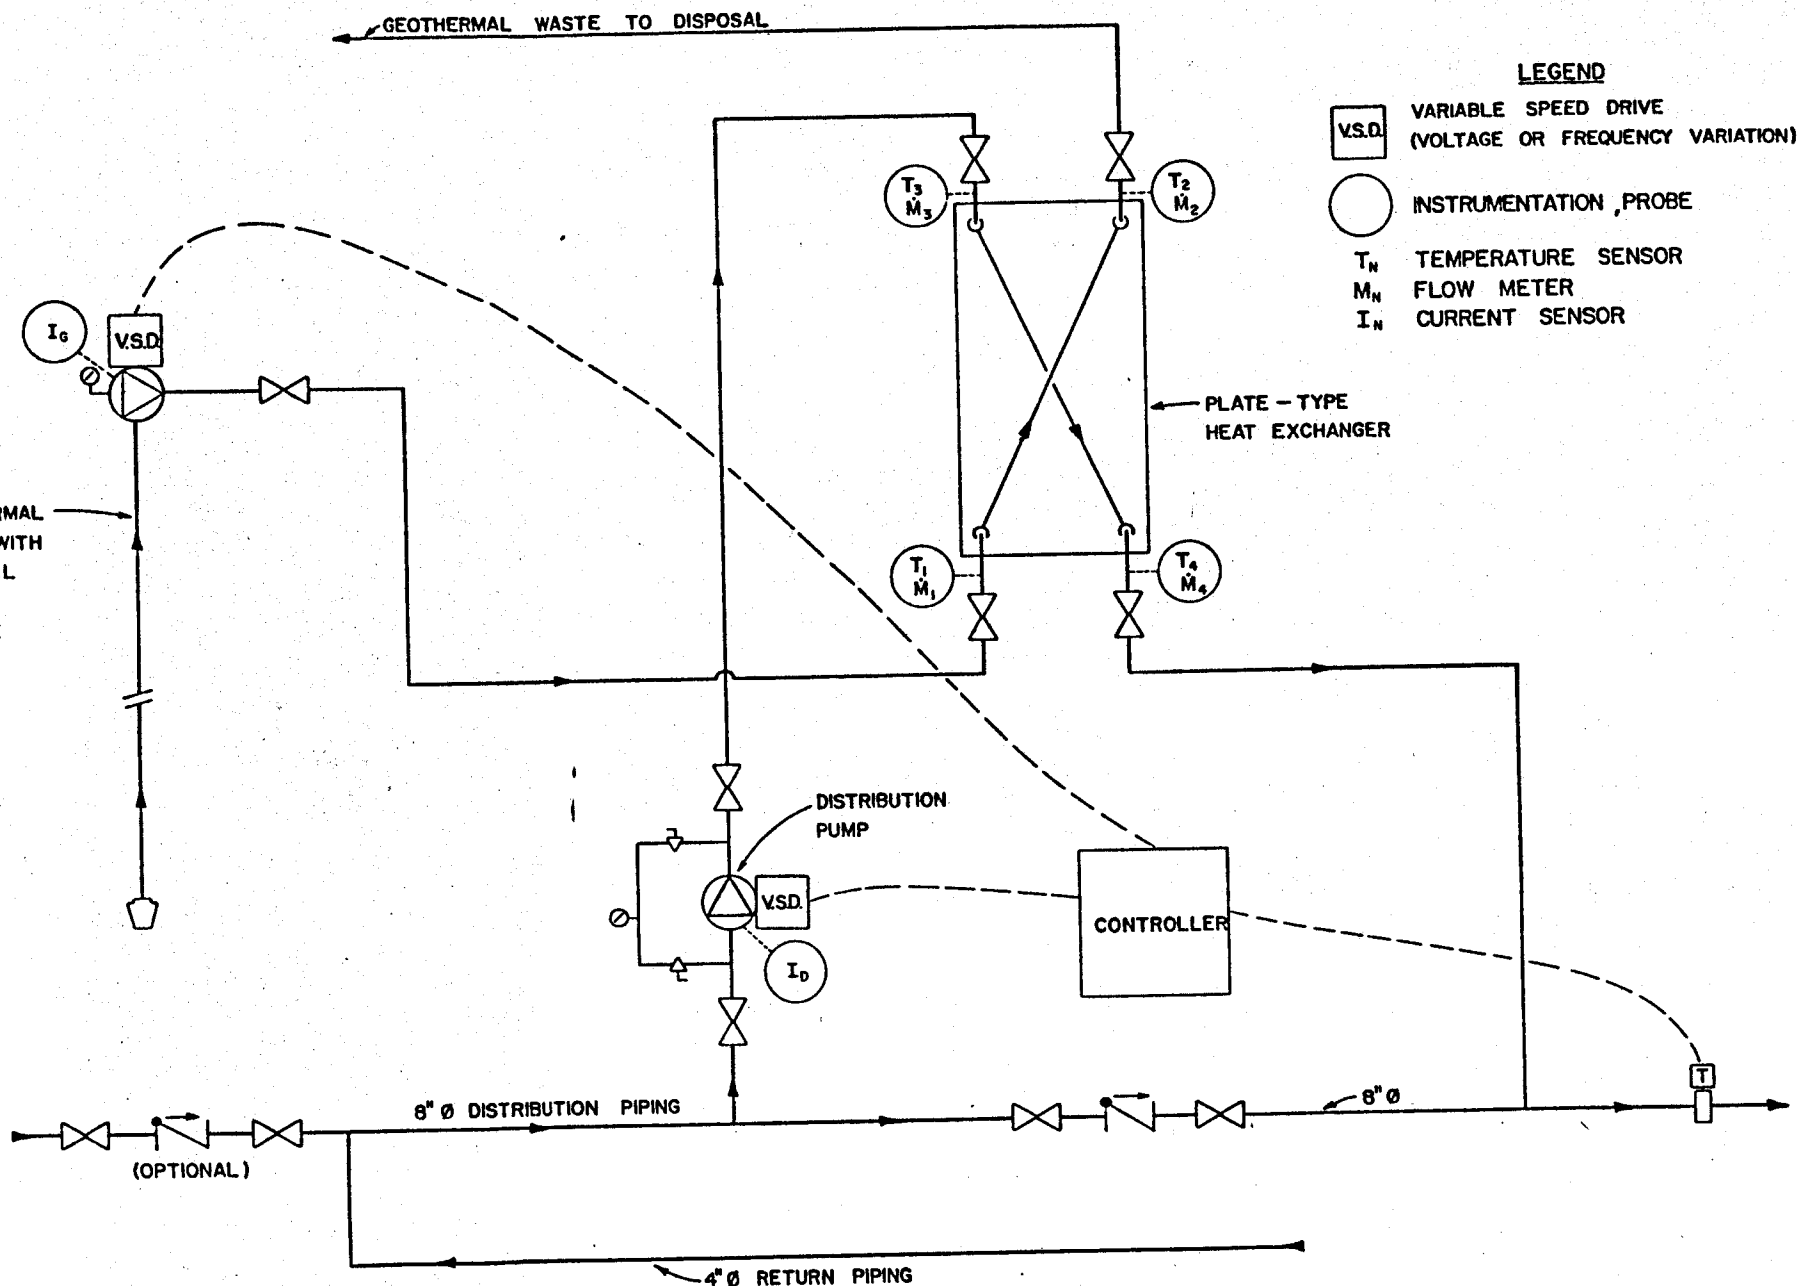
LAYOUT OF PROPOSED MAIN HEATING PLANT AND ADDED COMMUNITY PIPING FOR SUNRISE ADDITION SUBDIVISION
